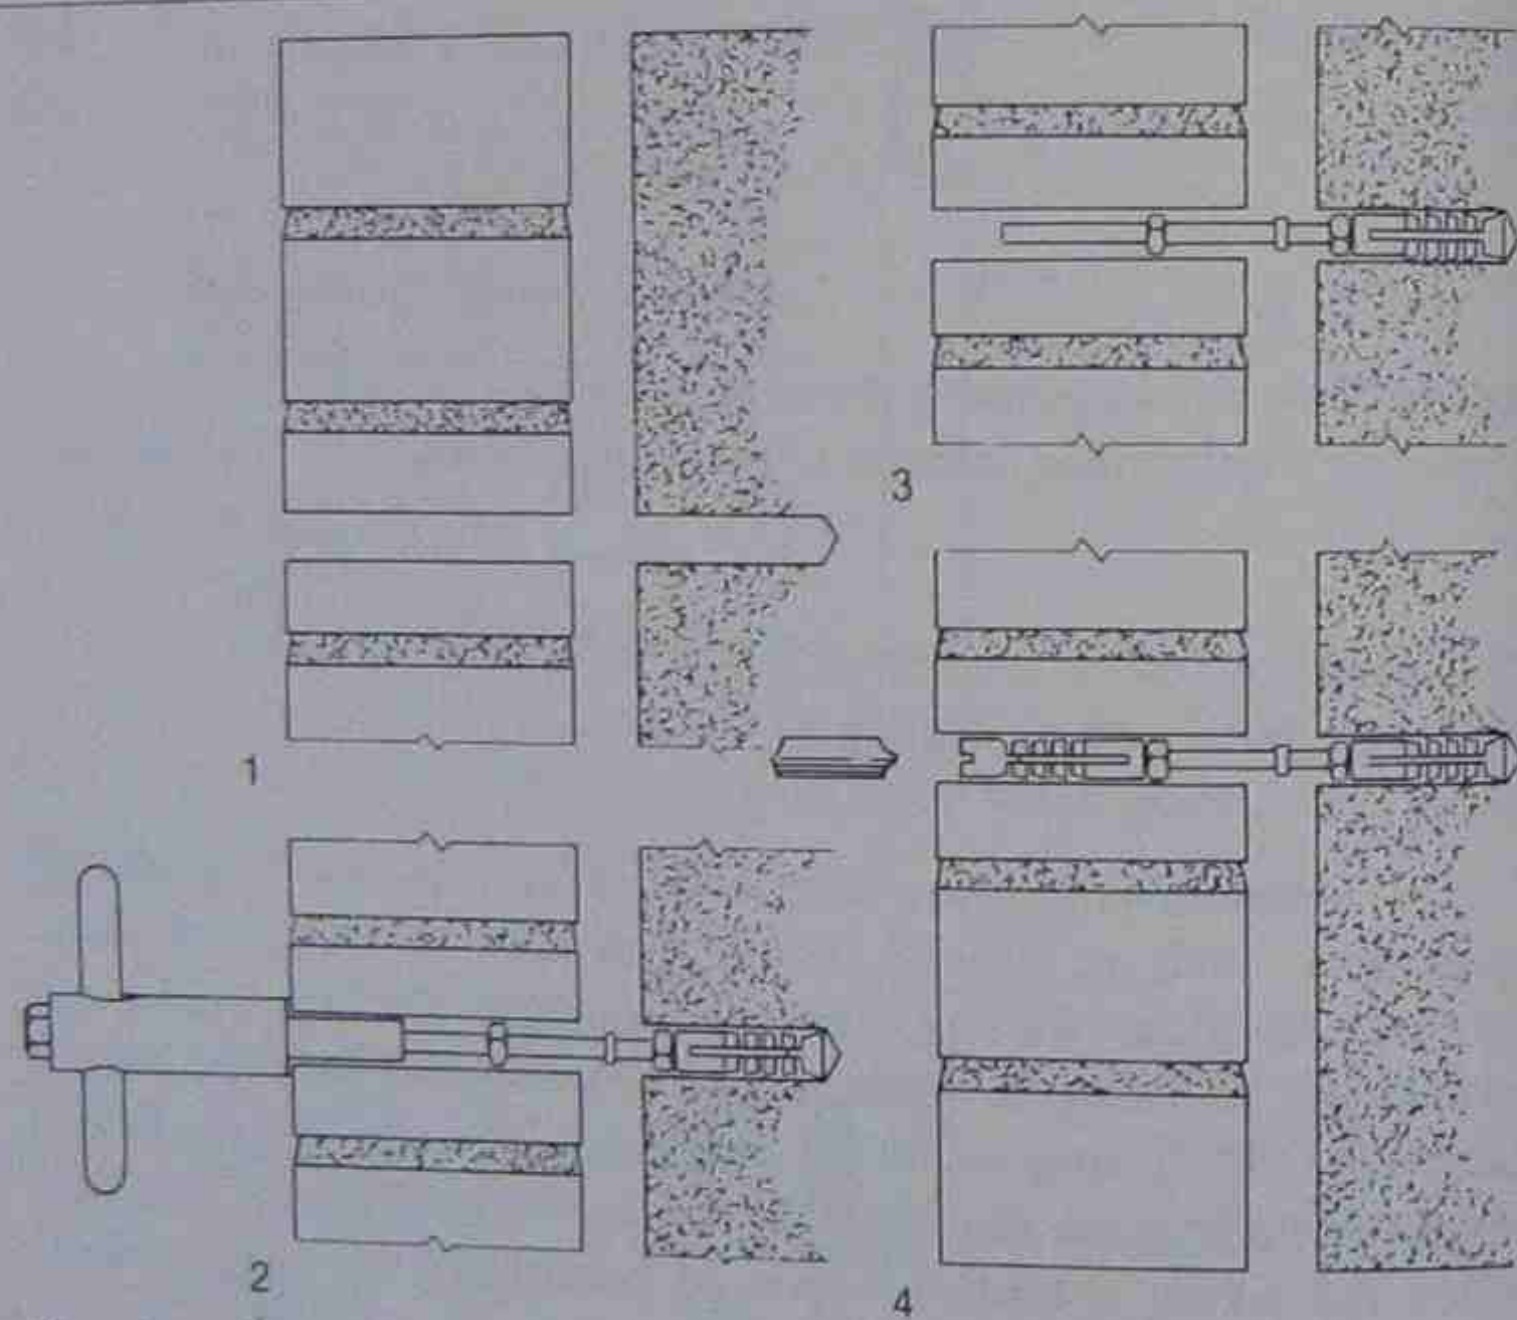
Cavity wall repair anchor (Harris and Edgar);
